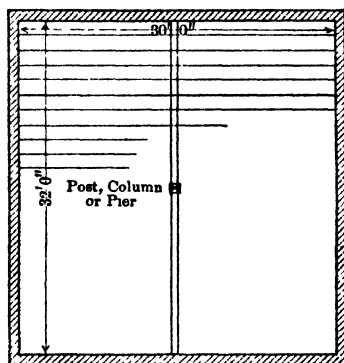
Joists Parallel to Shorter Dimension and Supported by Girder at Center of Span
